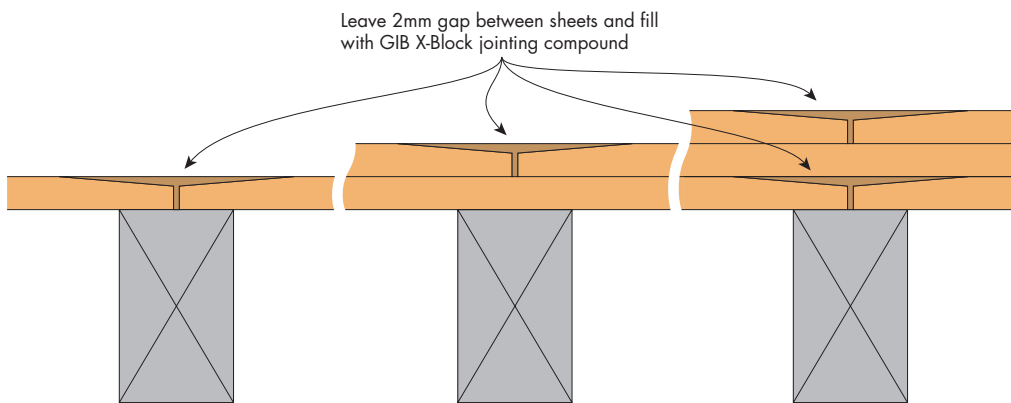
Completely Filling All Gaps and Recessed Joints
